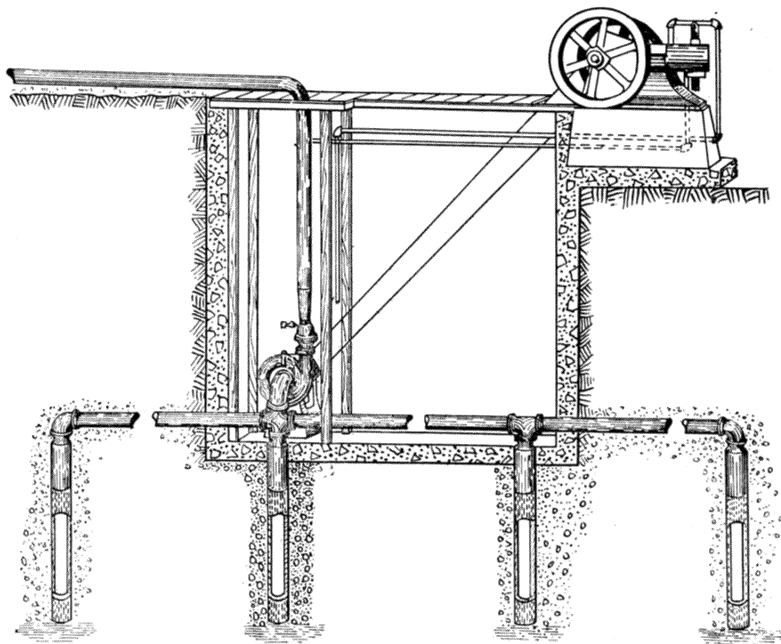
Horizontal centrifugal pump set in concrete pit, to pump from several connected wells. Pit is required because the suction lift from the gravel surface is more than 25 feet
